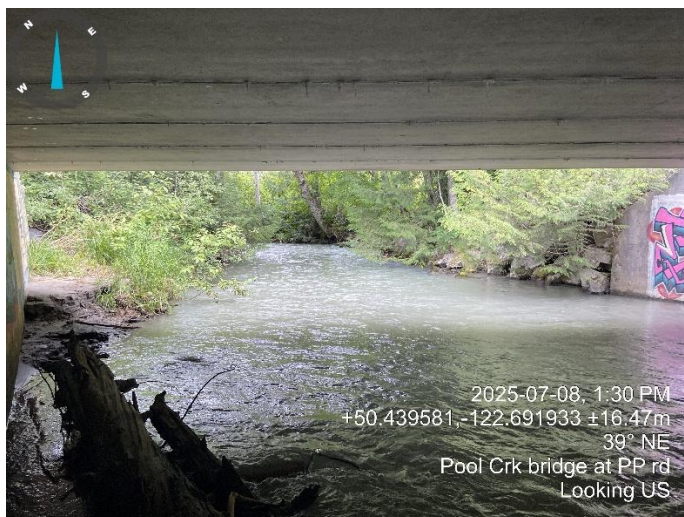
Looking upstream at channel from below Pemberton Portage Road Bridge
